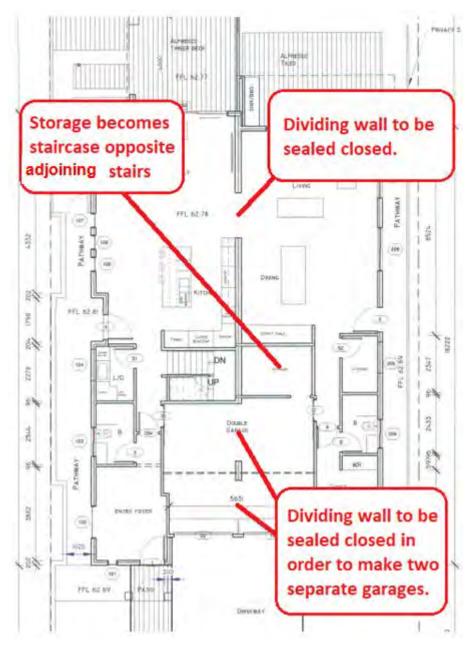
Existing ground floor plan of the recently constructed dwelling house with the relatively minor modifications highlighted that are necessary to facilitate the conversion of the building into a dual occupancy (attached) development.
